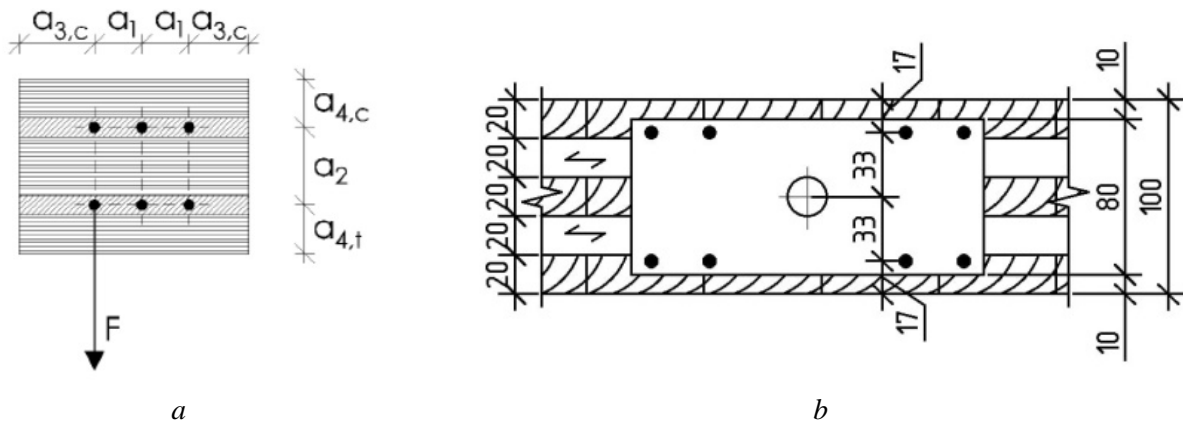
Minimum spacings, edge and end distances for laterally loaded dowel-type fasteners in the narrow side of cross laminated timber acc. to ETA 21/0914 [4] (a) and in tested specimens (b).
